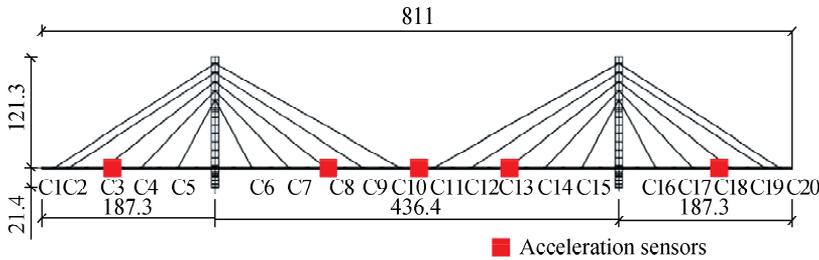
Cable-stayed bridge sensor layout diagram (unit: cm)
